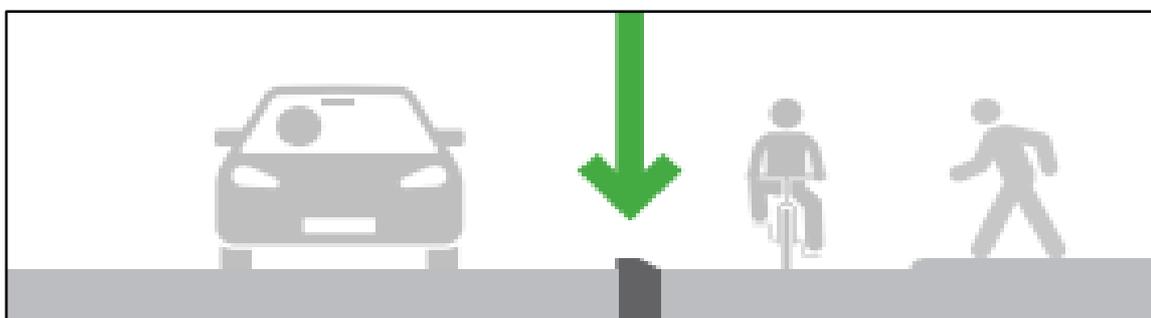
Image Showing the Raised Concrete Separator Kerb Proposed Along the Goatstown Road
